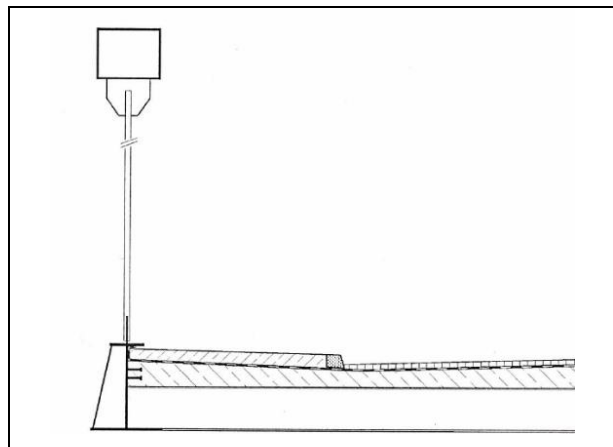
Cross-section through a tied-arch bridge (half) in composite construction [1]
